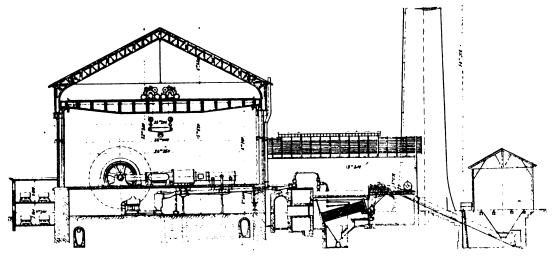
FIG. I .- ELEVATION PLAN OF IVRY ELECTRIC LIGHT & POWER STATION, PARIS, FRANCE.
